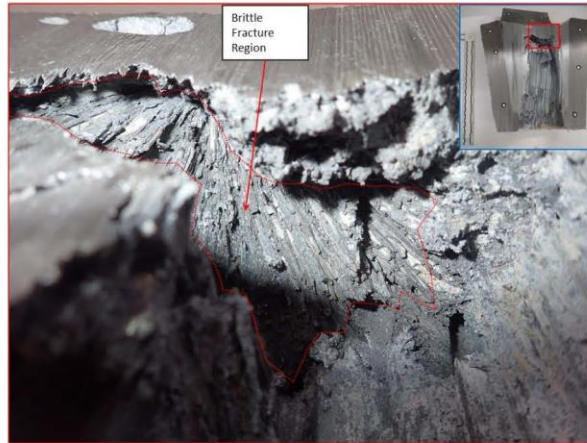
View of the casting cap side of the brittle fracture region in the back of the socket cavity on slice 3a. The fracture surface can be seen extending from the wire channels from the outer diameter of the cable-end section that pulled free of the socket during the ultimate failure up to a point just below the gas bubble. The gas bubble can be seen at the top left of the image.
